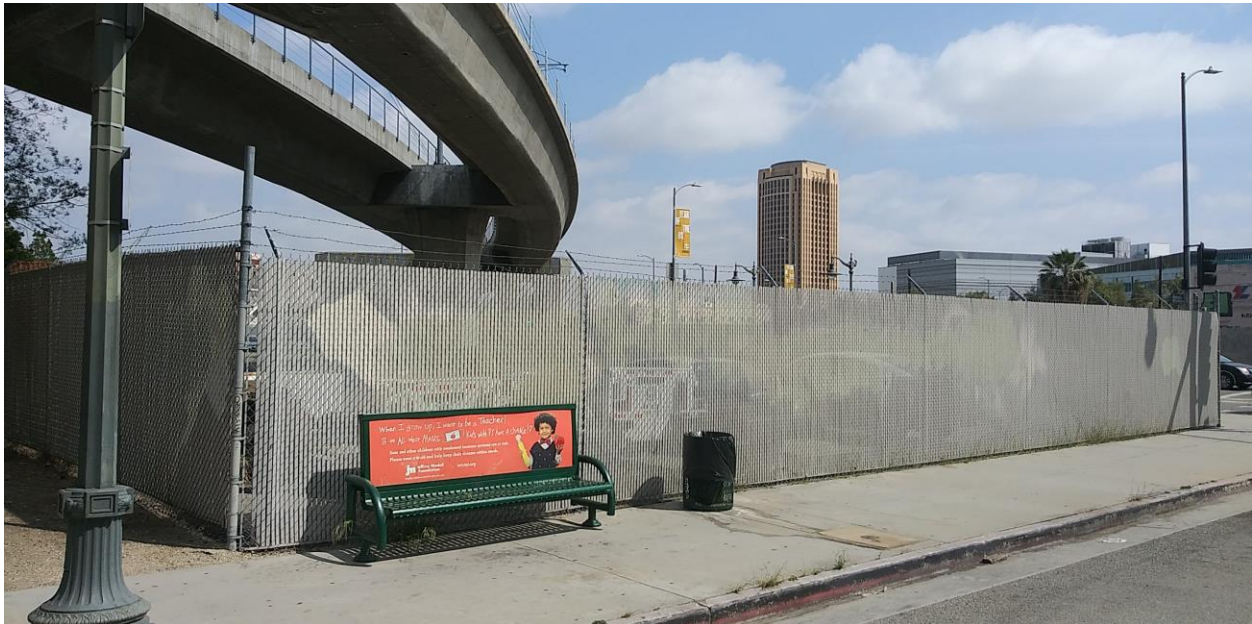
Southeast-facing view from Alameda Street of City-owned parcel proposed for the Alpine Tower, which would be constructed to the right of the elevated Metro L Line (Gold) structure.
